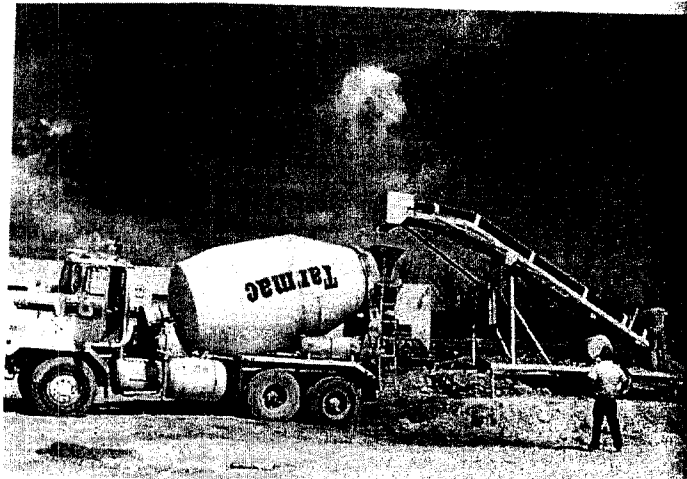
Adding steel fibers to a loaded mixer truck via a conveyor (ACI 554. 1R, 2005)
